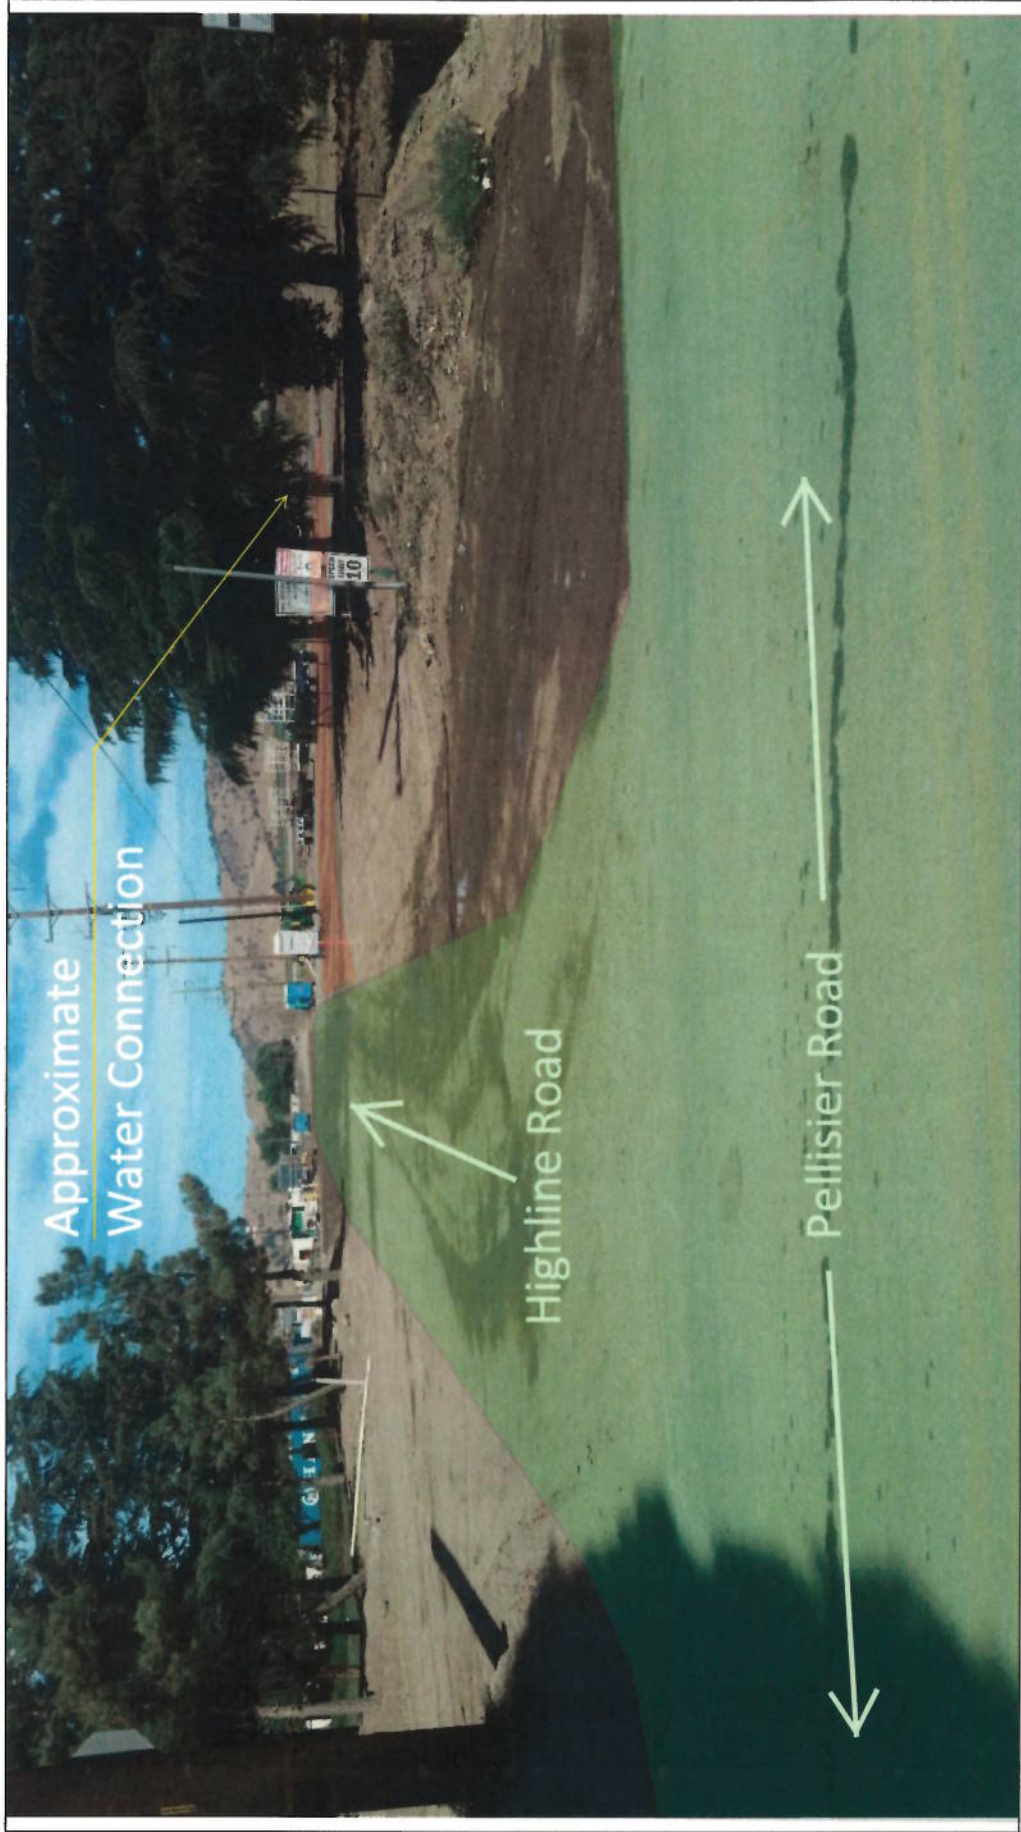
View east from intersection of Pellissier Road and Highline Road.
